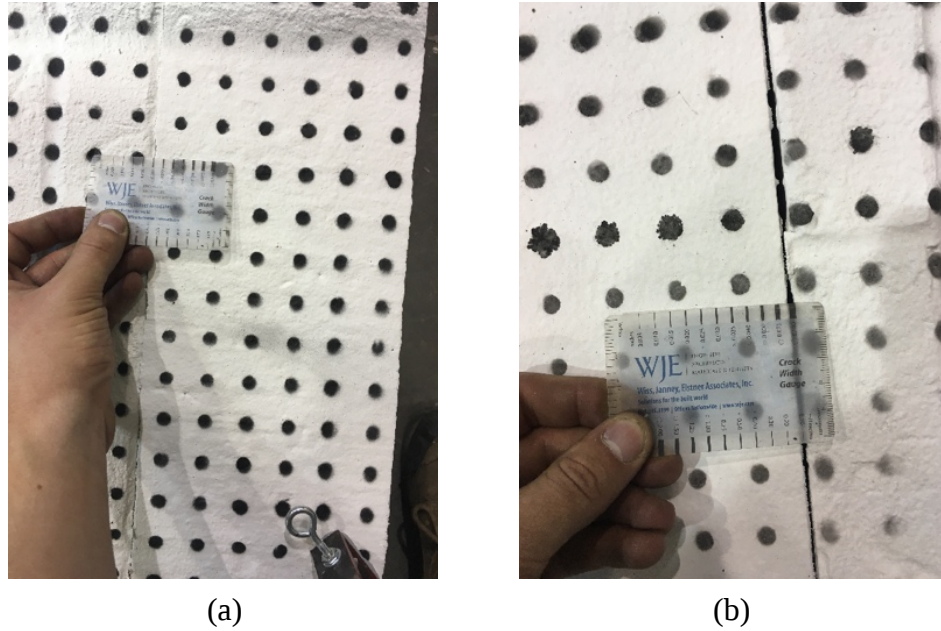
Gaps between the masonry panel and concrete frame of the masonry infill wall prior to testing (a) located at the bottom of the frame and (b) the top of the frame
